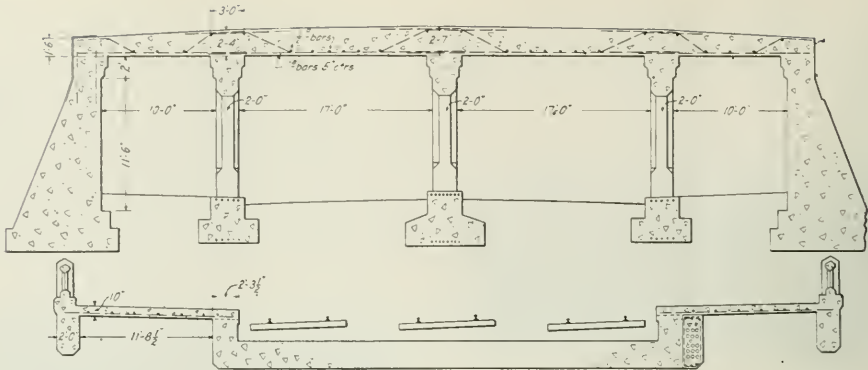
Typical Details of a Reinforced Concrete Slab Subway Continuous Over Three Supports
